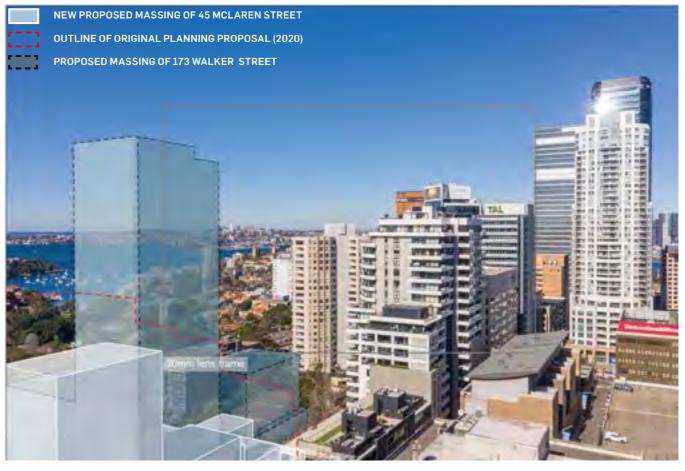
PHOTOMONTAGE INDICATING PROPOSED INDICATIVE BUILDINGS
